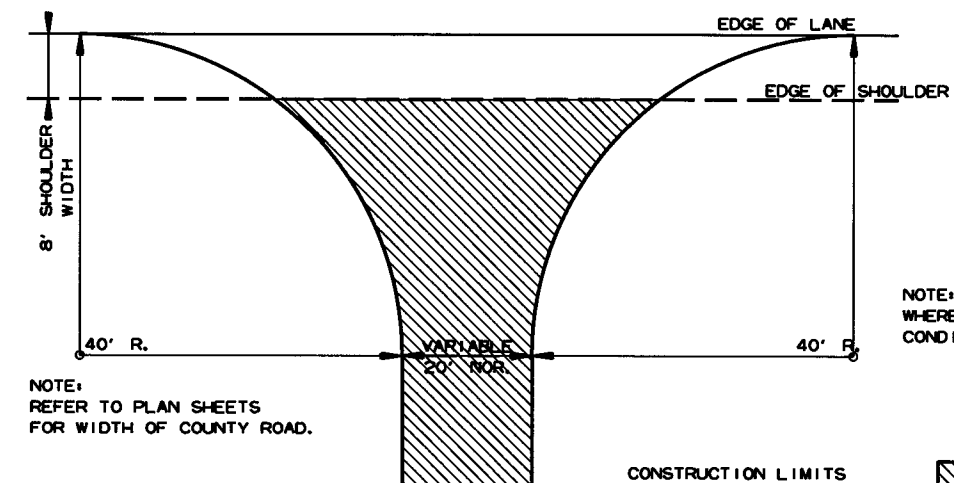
DETAIL FOR DRIVEWAY TURNOUTS OPEN SHOULDER SECTION (ARTERIALS)
